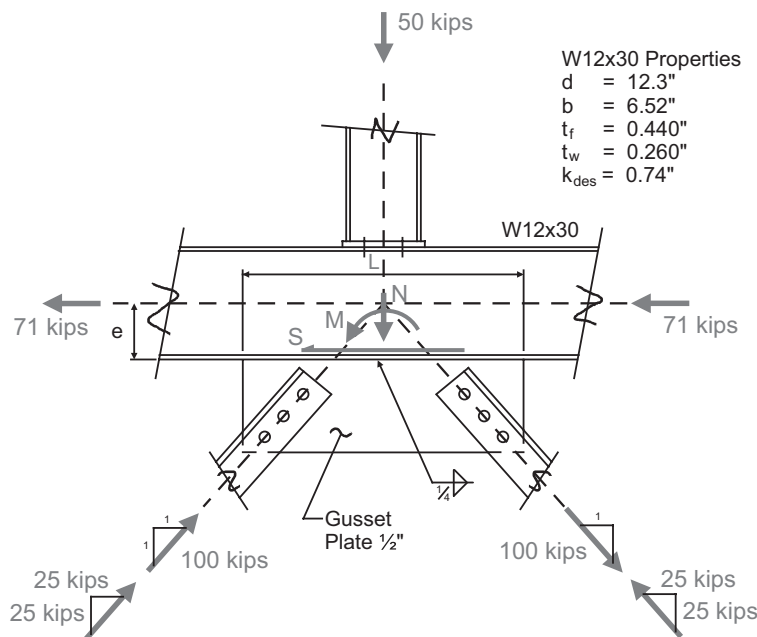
Design Example 2—gusset weld connection example.
